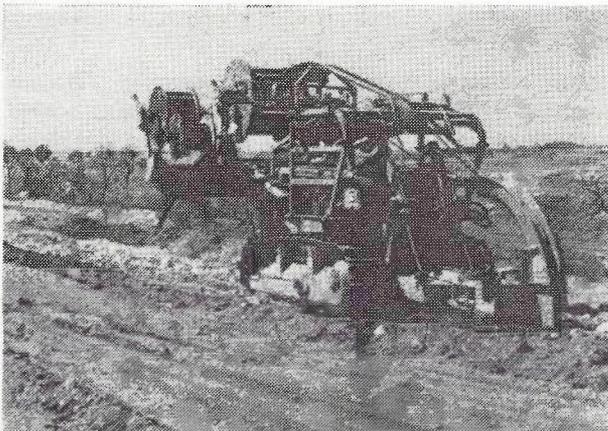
A Typical Mole Plough Cable Laying Machine.
